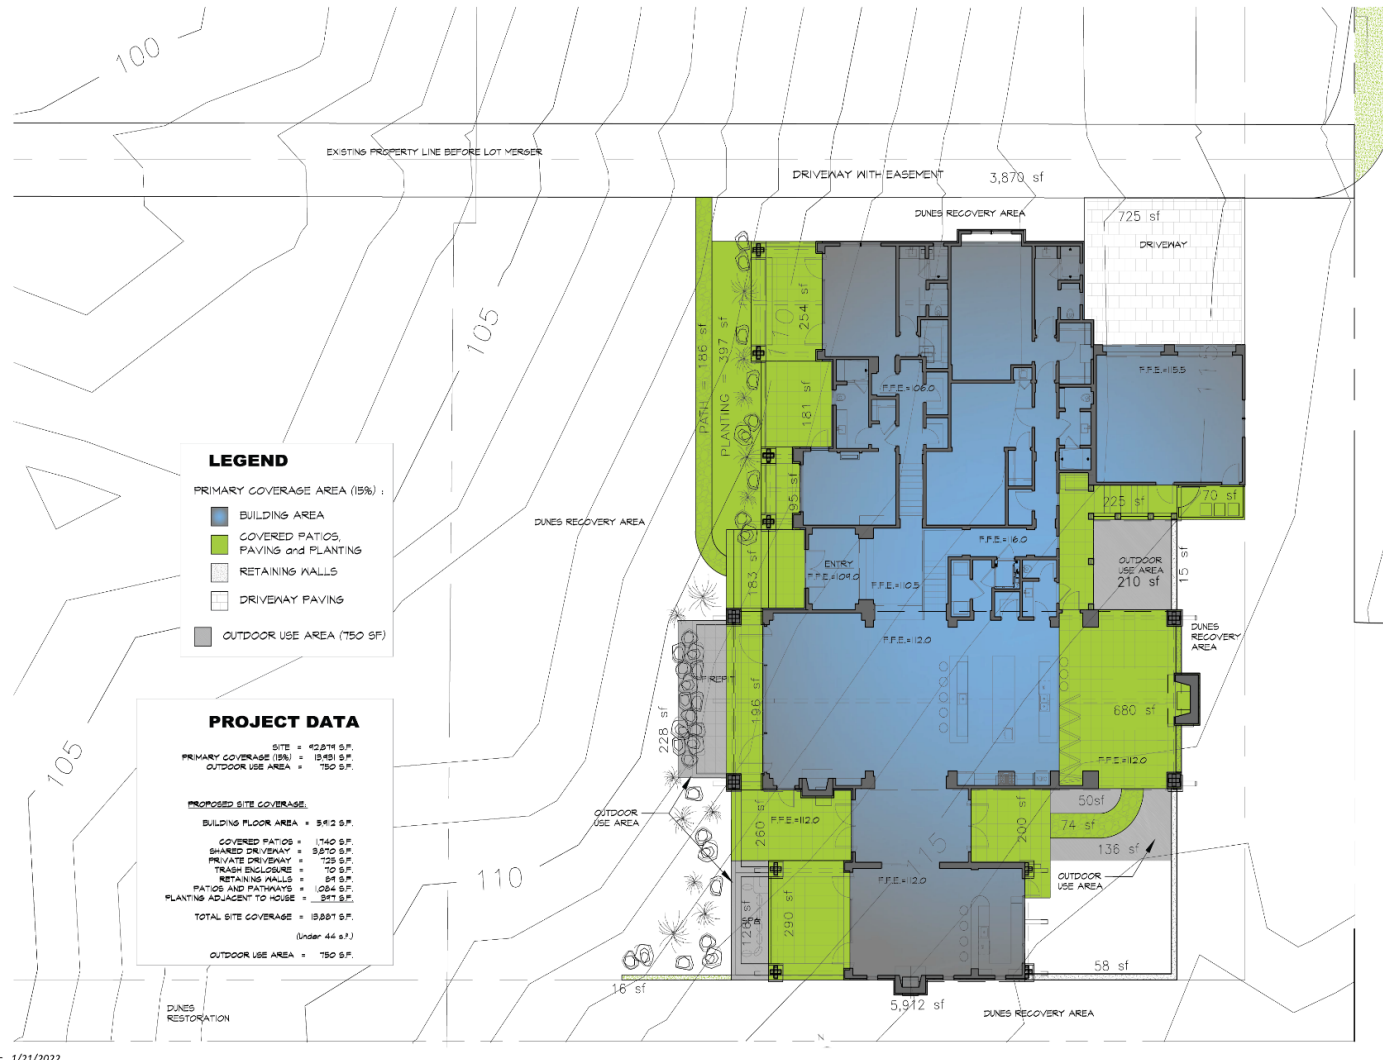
Project Site Plans: Proposed Residence Site Plan
